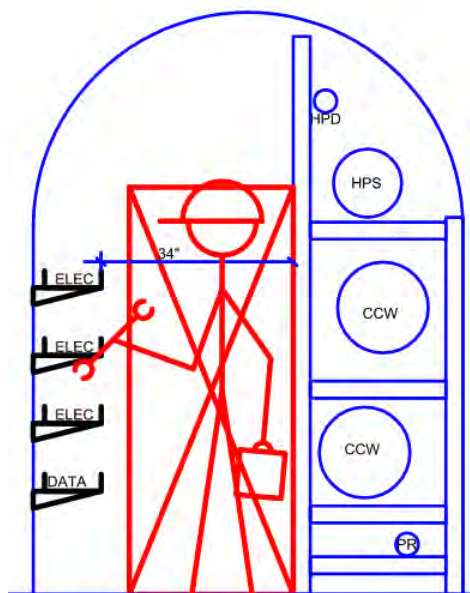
Representational tunnel section from the Campus Parkway (CP) tunnel system in west campus.
